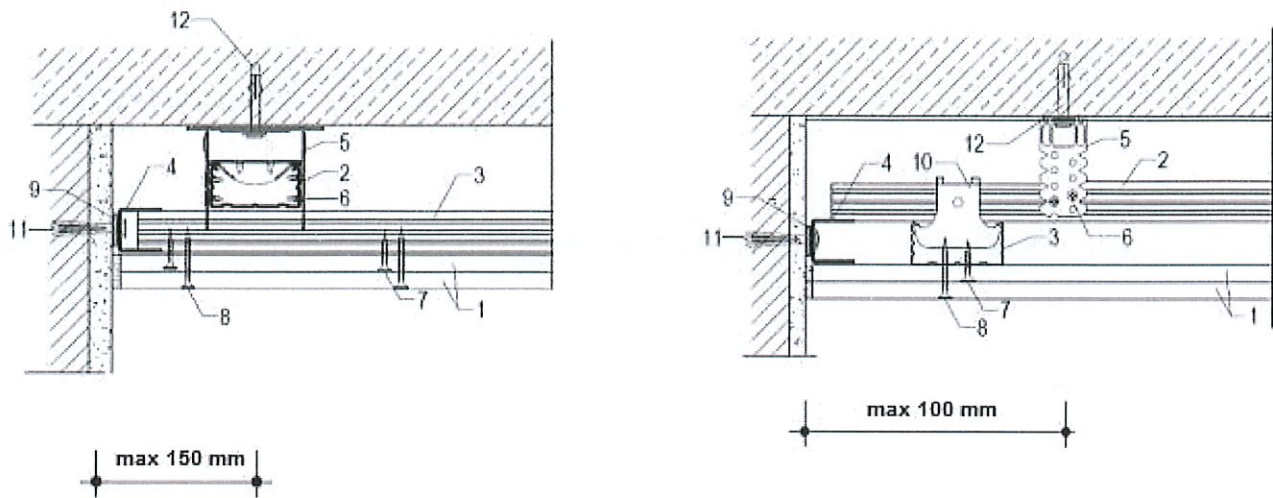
Longitudinal section of the suspended ceiling – two level cross construction
